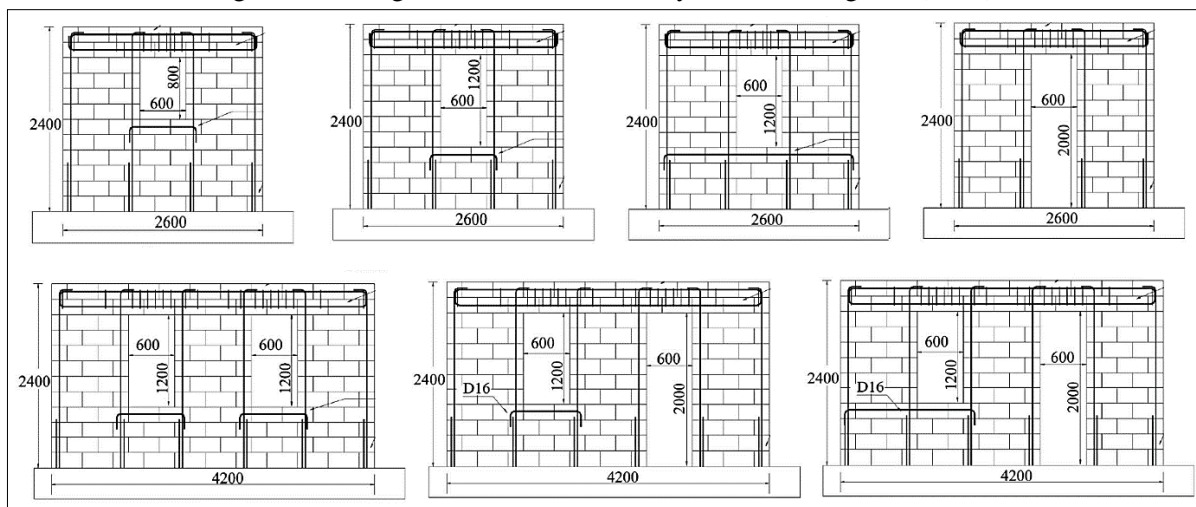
Arrangement and instrumentation of walls tested by Voon and Ingham (2006).
